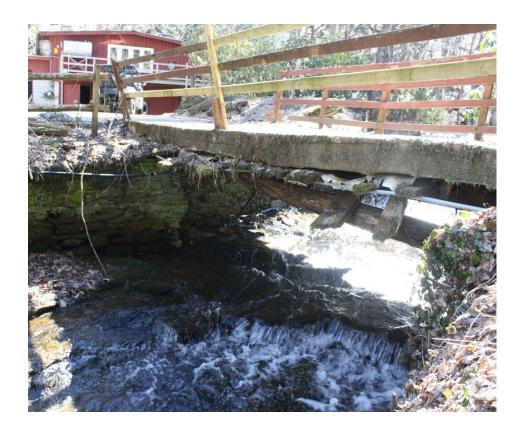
Bridge over Trivett Branch on the downstream side of the dam at the Ray Estes Complex (WT0954).
